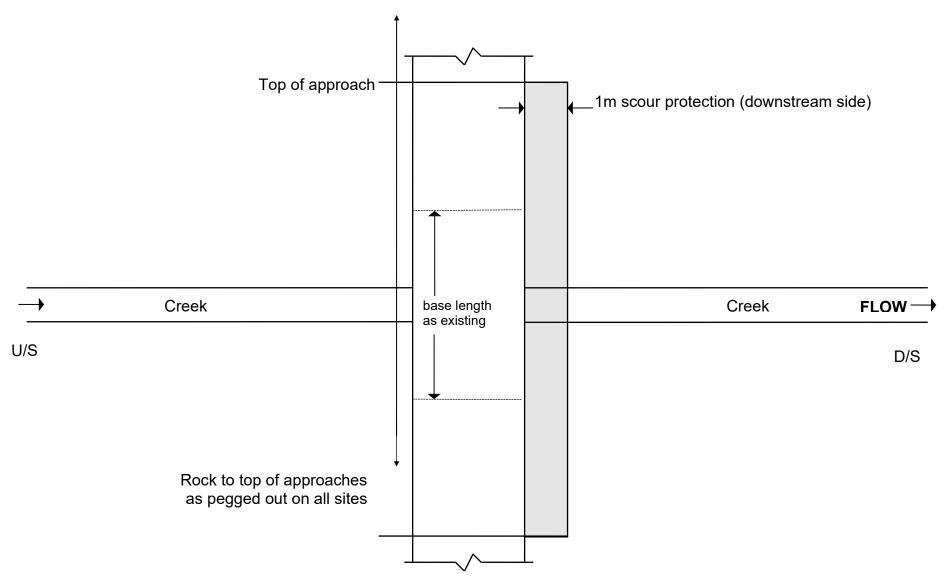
8-2 FLOODWAY DESIGN - PLAN VIEW - (not to scale)
